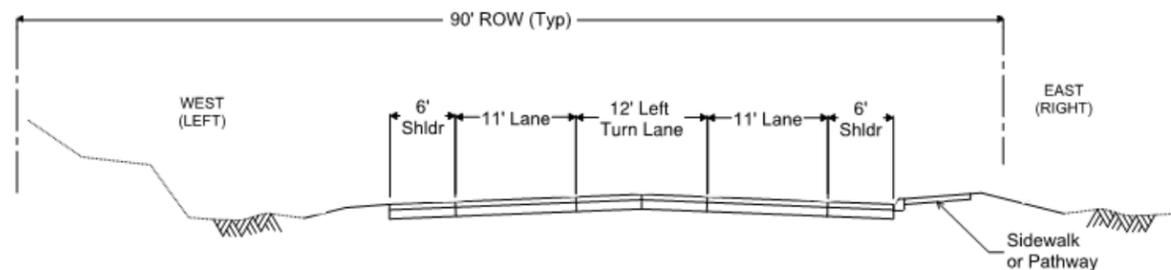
Typical Section with Adjacent Sidewalk or Pathway, East Side Only
